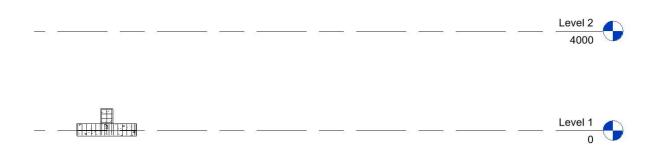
Placing Rebars in Wes Cross Section Plane (produced by the author
